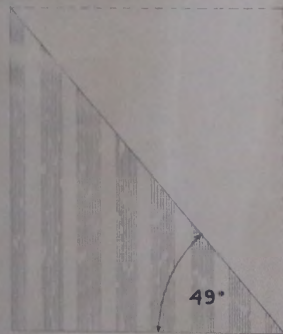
DETAILS OF SHEETS TO BE CUT ON HIPS. ROOFS MARKED "A"
